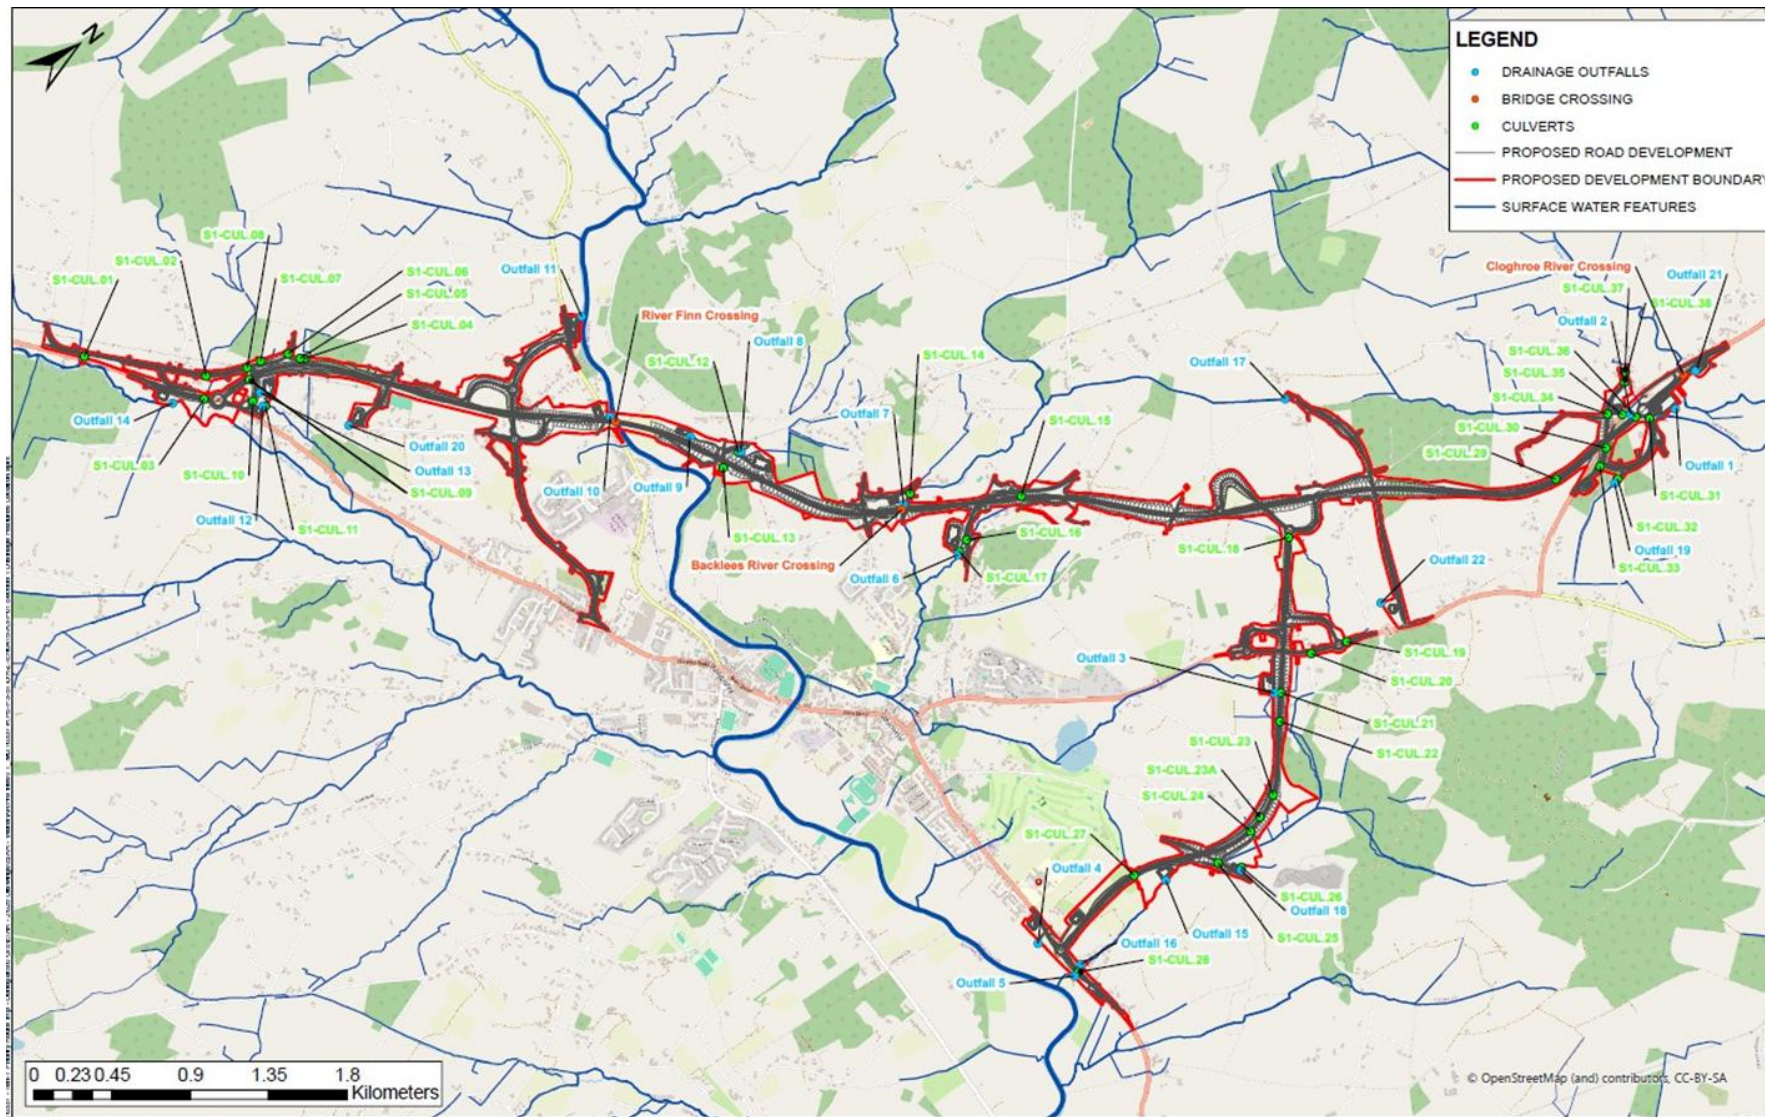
Locations of Bridges / Culvert Crossing and Drainage Outfalls
